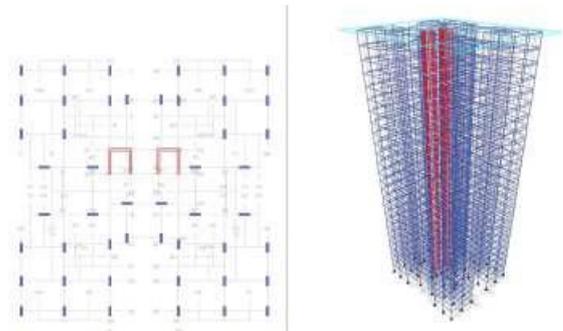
Plan and Elevation of G+25 RC multistoried framed Building in ETABS2013
